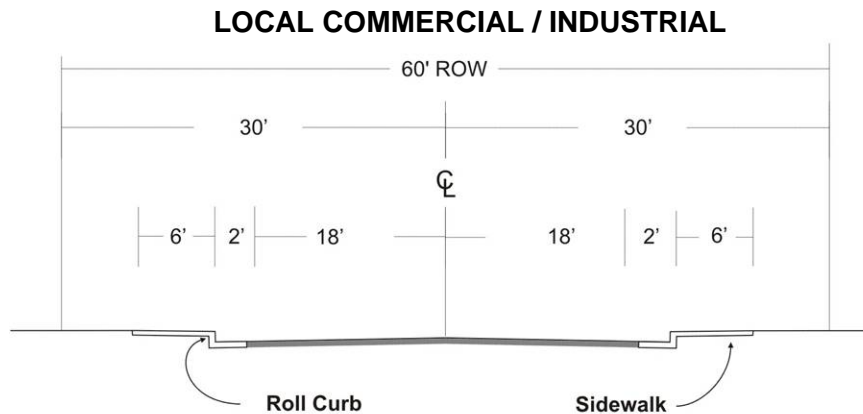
ROADWAY CROSS SECTIONS (Continued)
